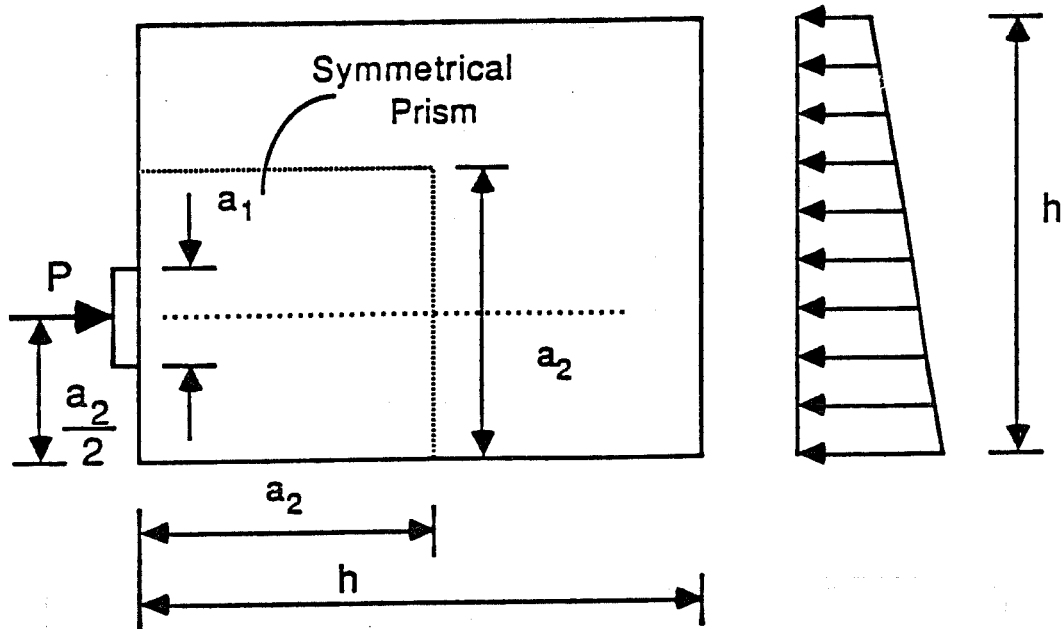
Guyon's Symmetrical Prism for Eccentric Anchorage Zone
